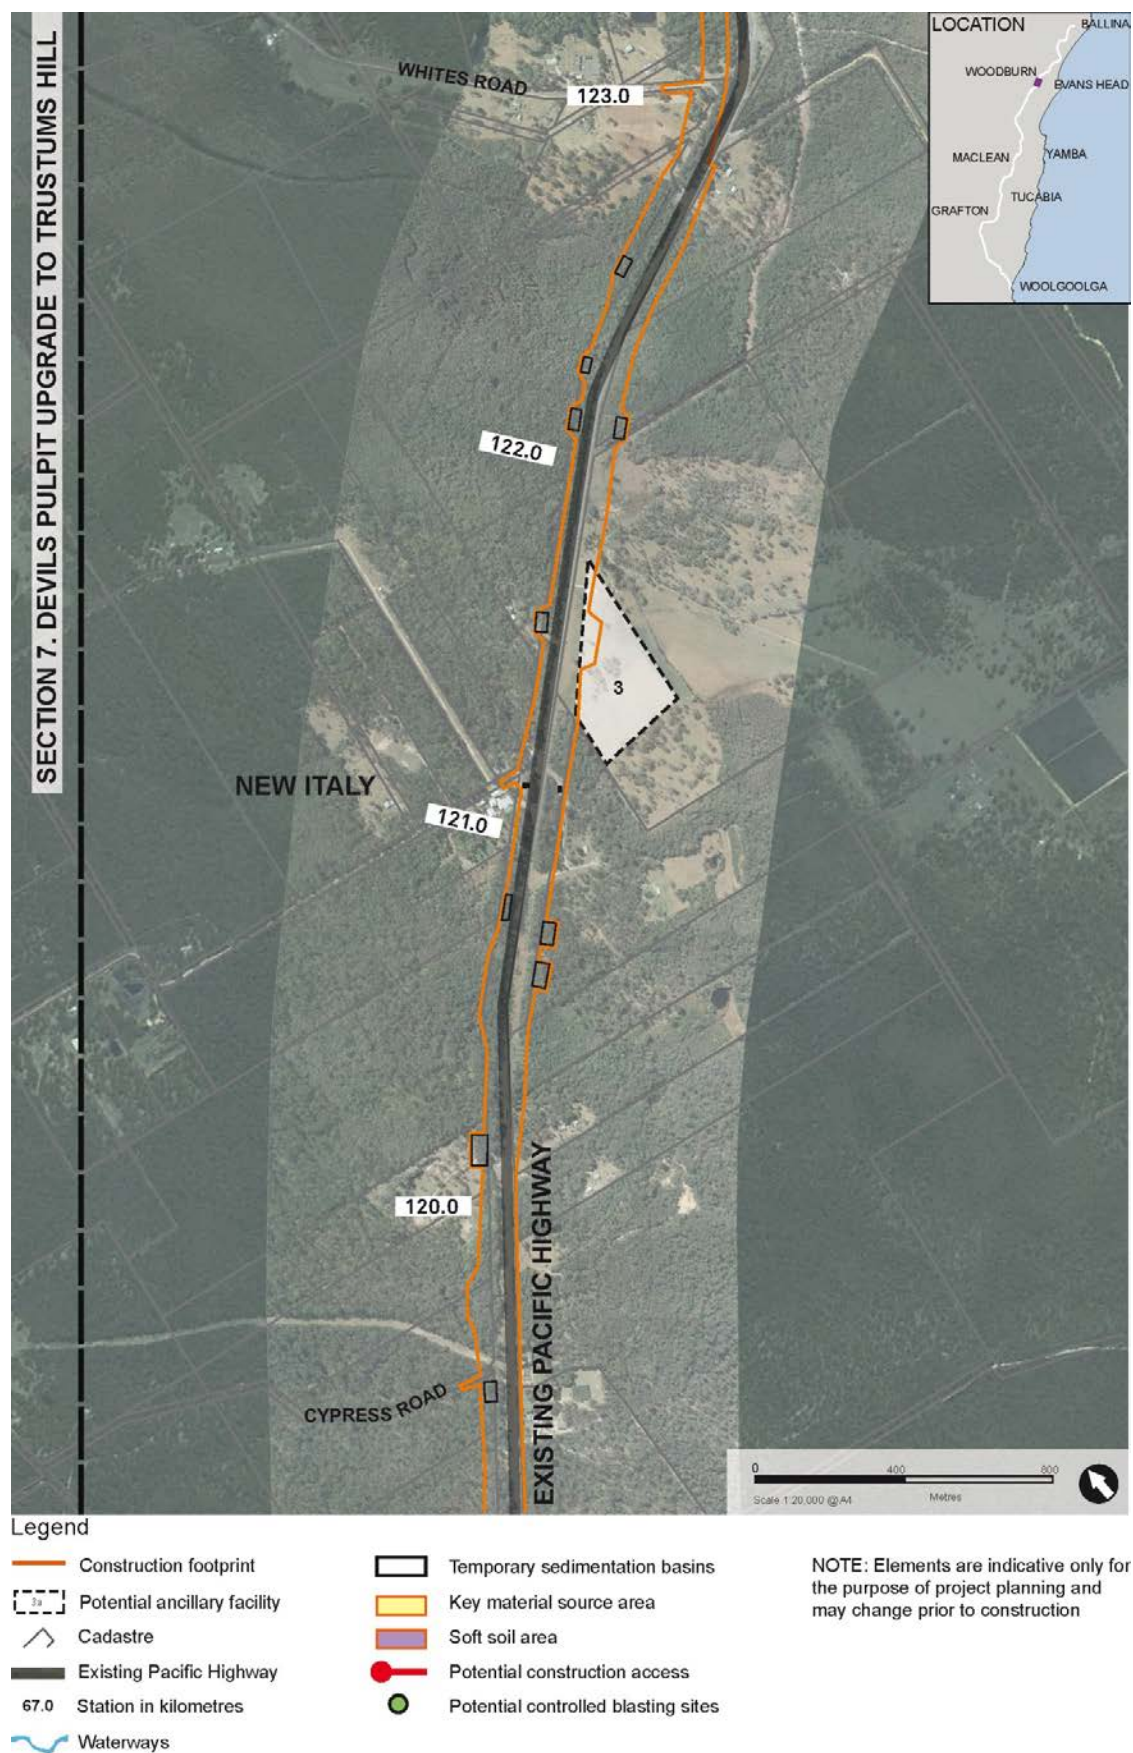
Extent of construction and construction features Section 7 (Station 119.3 to 123.2)
